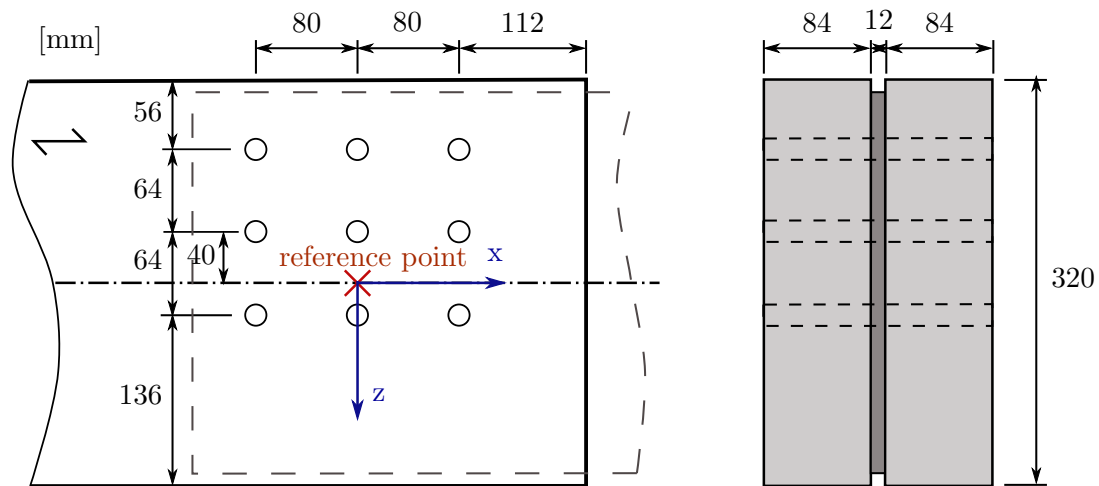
Elevation (left) and cross section (right) of a excentric dowel connection.
